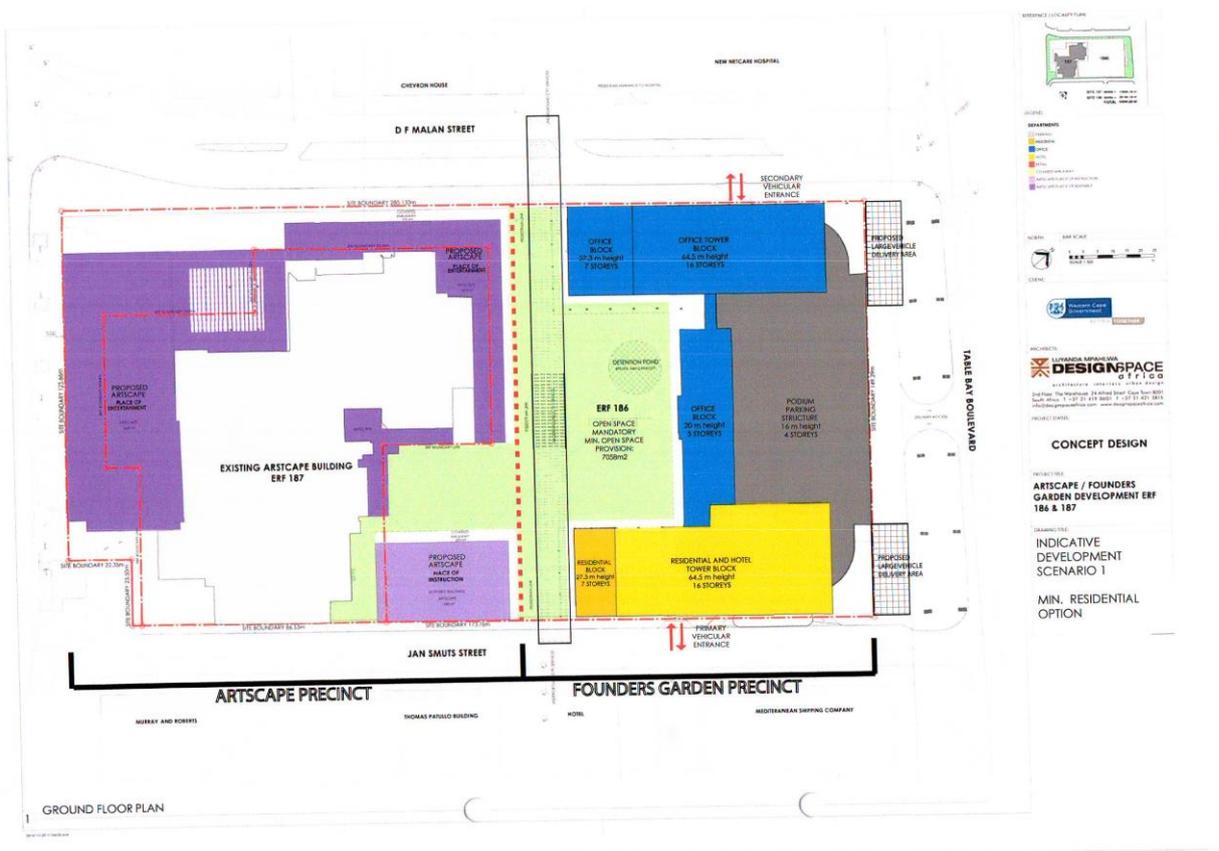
LAYOUT PLAN -SCENARIO 1 (Design Space Africa)
